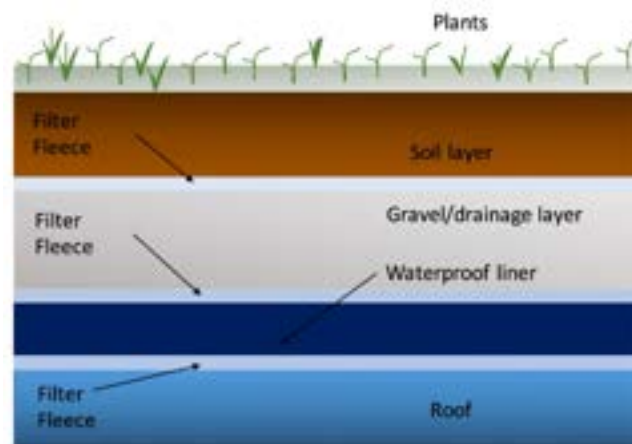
Typical cross-section of a green roof [Eckart et al., 2017]
